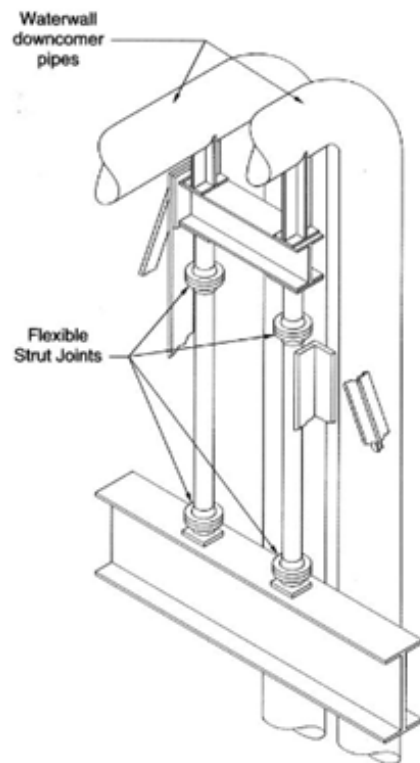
This is a supporting arrangement for boiler water wall downcomer pipes in a large steam generating station. Two Flexible Strut Joints are used as compression members. They eliminate the need for overhead hanger steel which would cantilever beyond the column. Conical action of the strut joints accommodates lateral and axial movement of piping.
